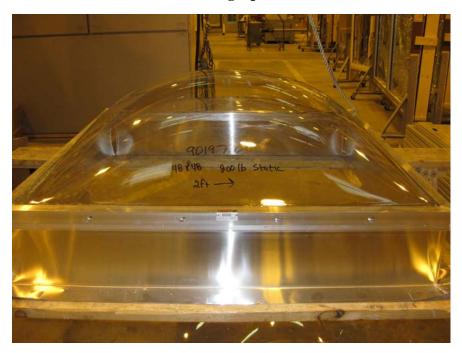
Test Specimen #1 (48 x 48) Test Set-Up
